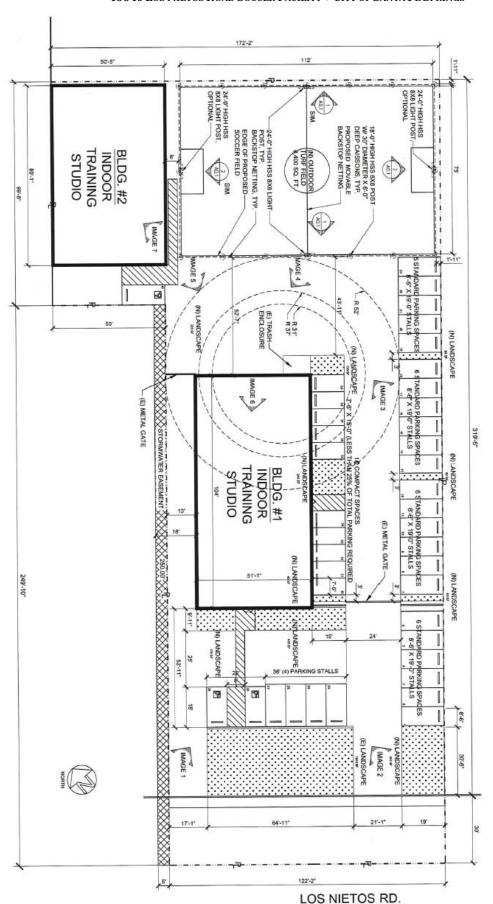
CONCEPTUAL SITE PLAN SOURCE: R. G. DESIGN SERVICES
